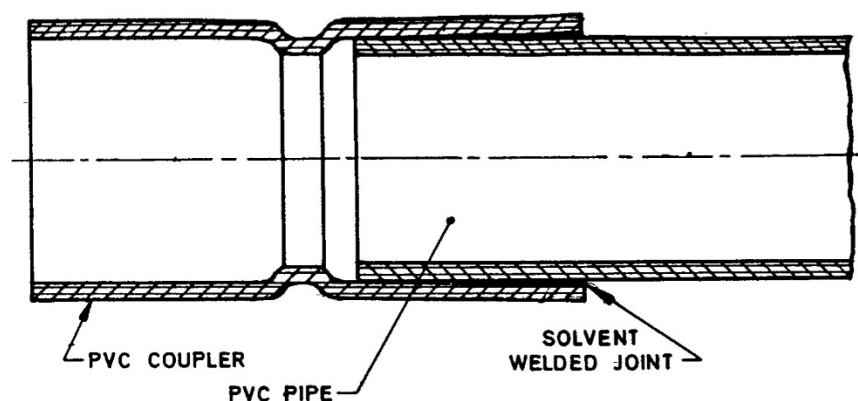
PVC SOLVENT WELDED JOINT
